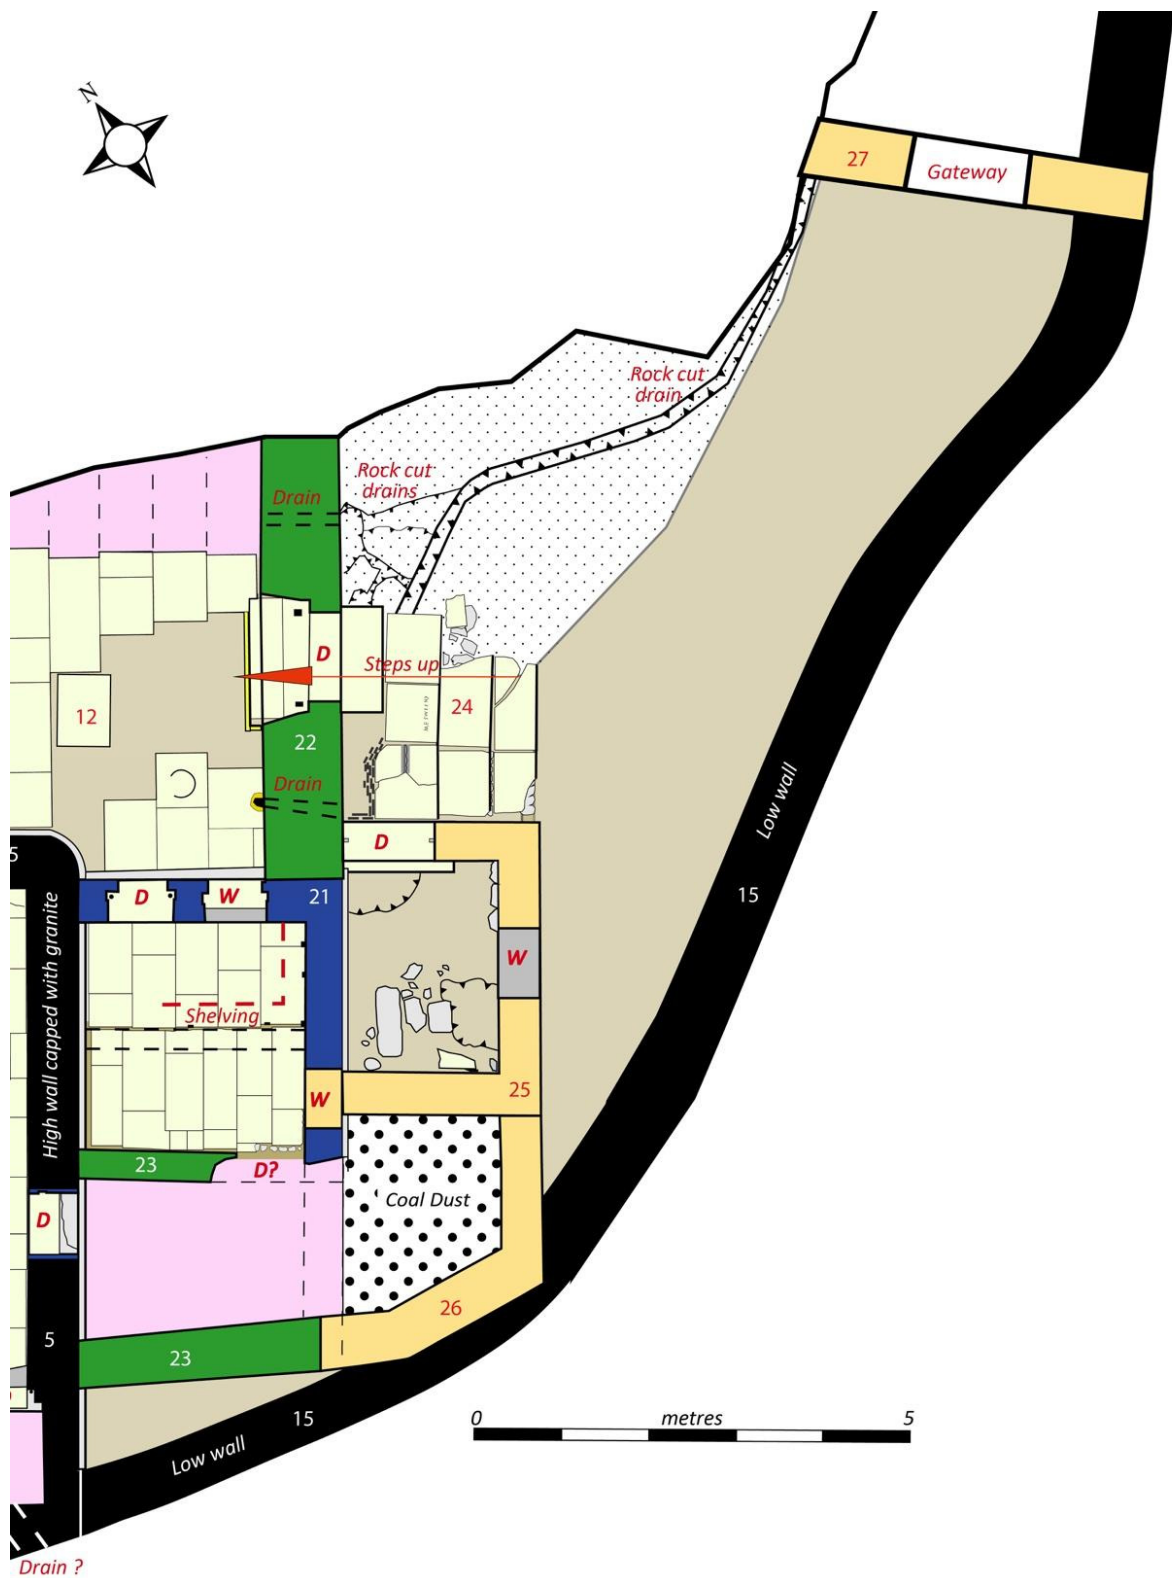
Post excavation plan of the structures and features added at the east end of the North Terrace.
